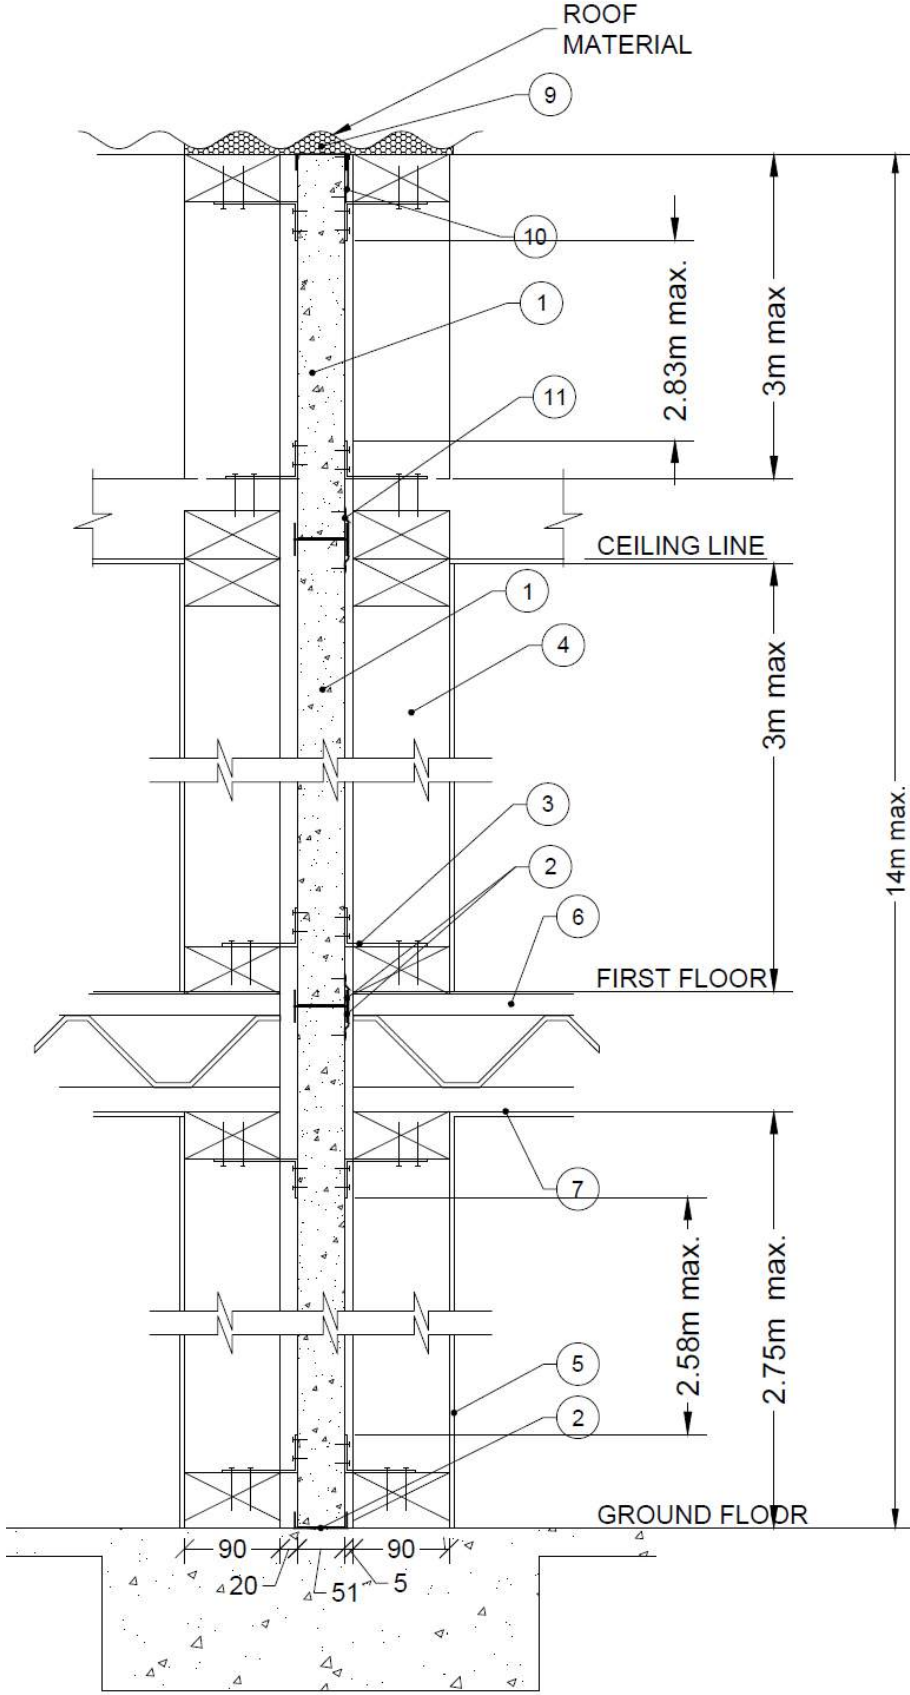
Section Elevation of Speedpanel Partywall System for 60/60/60
